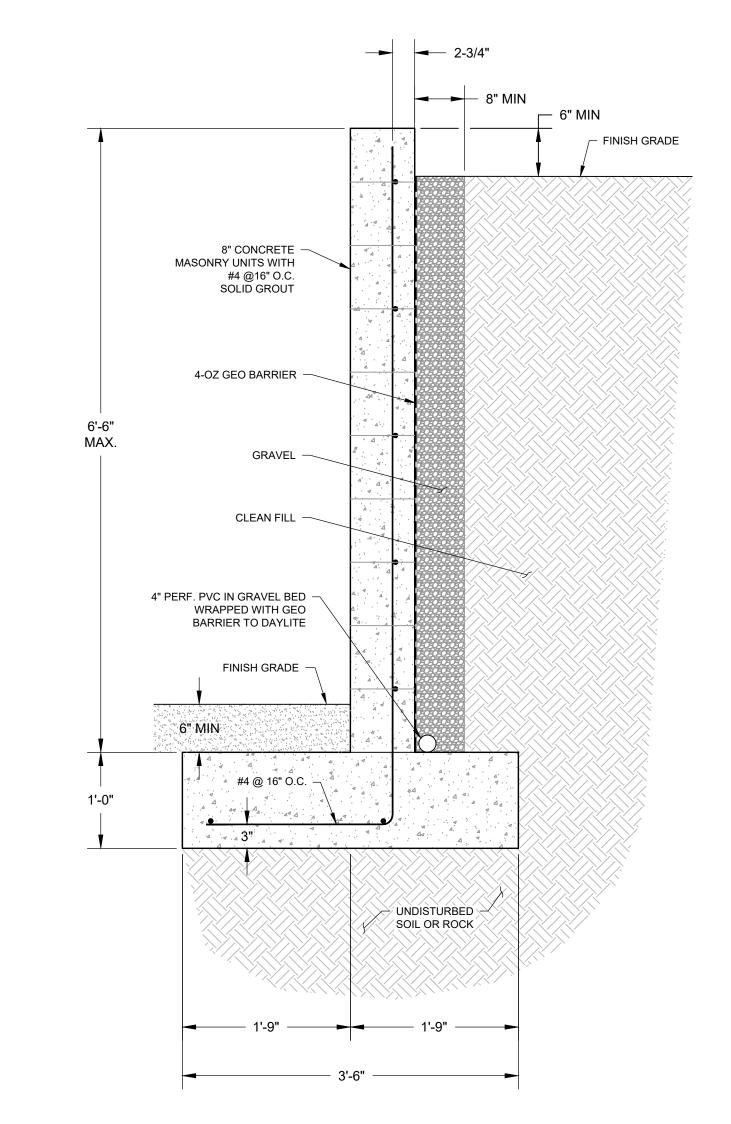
### DETAIL 'C' RETAINING WALL (UP TO 6'-6" HIGH) SCALE: 1" = 1'
